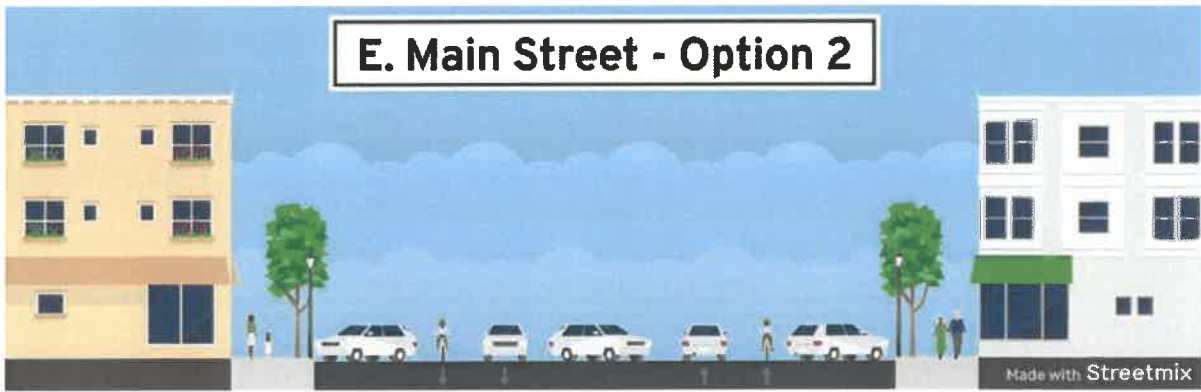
Downtown Streetscape Alternate Layout - Option 2
